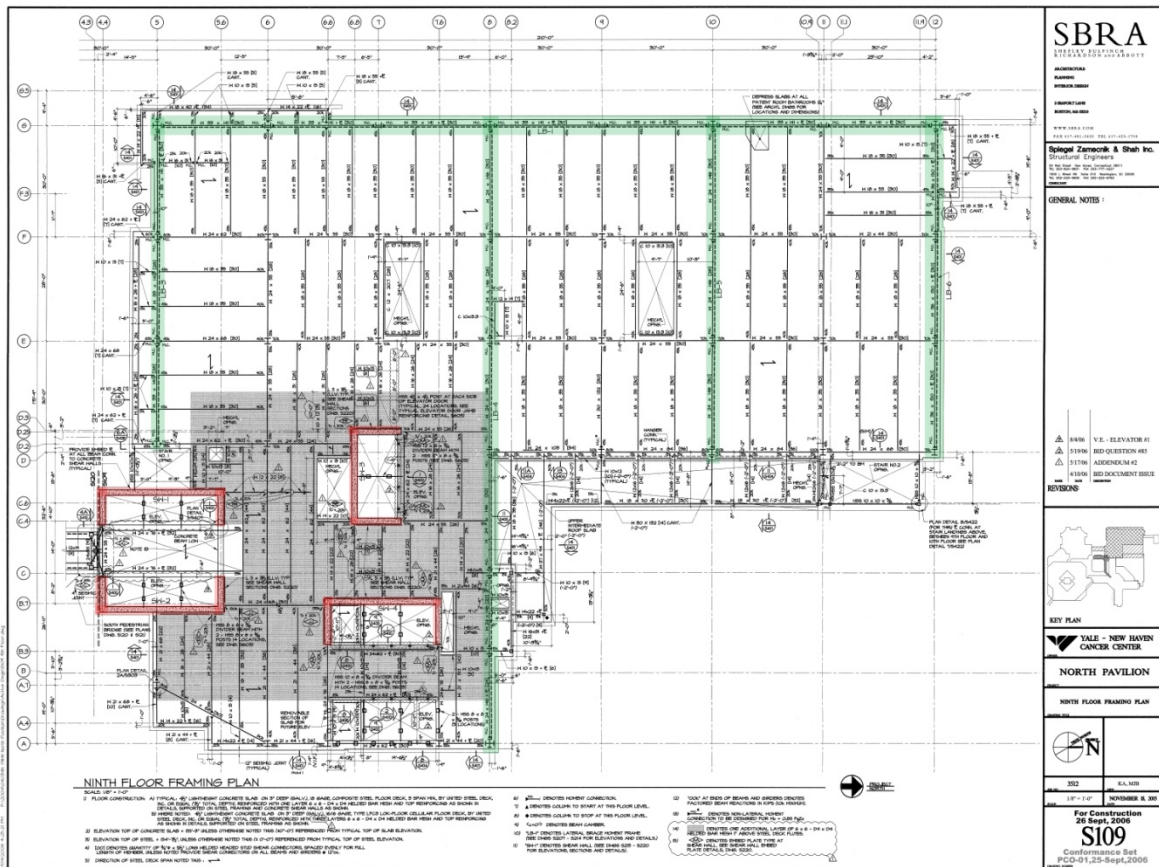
Typical Framing Plan for Levels 7-17. Green denotes Moment Frames; Red denotes Shear Walls.
